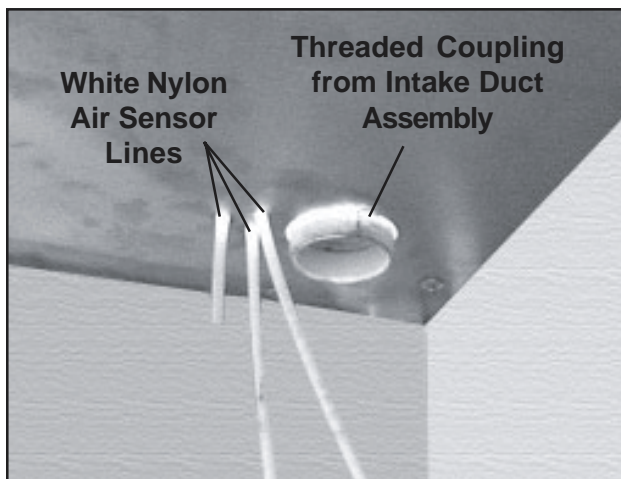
Air Sensor Lines & Coupling Passing Through Right Ceiling Panel
